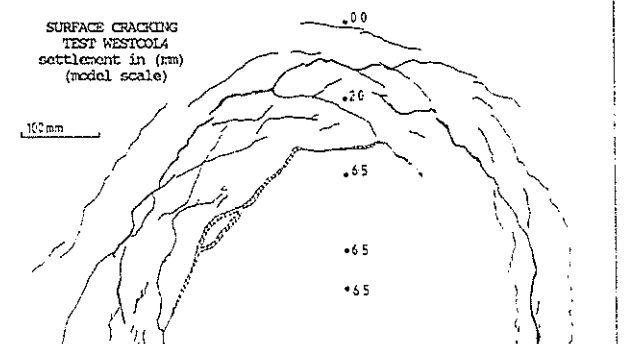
Trace of ground surface crack pattern after test Westcol4.
